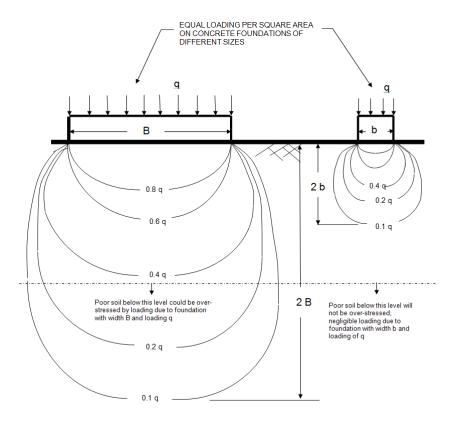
Illustration of Load Distribution below Variable Size Foundations with the Same Applied Loading
